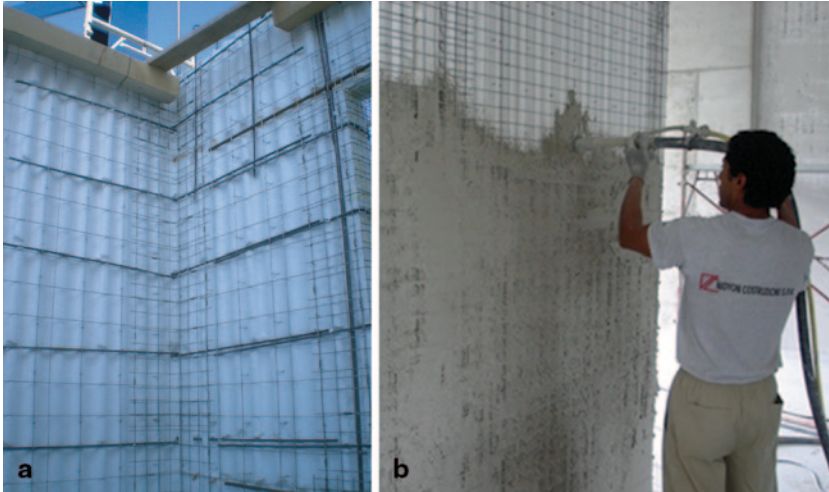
a Vertical wall at the inside corner of the building. b Shotcrete on the panels
